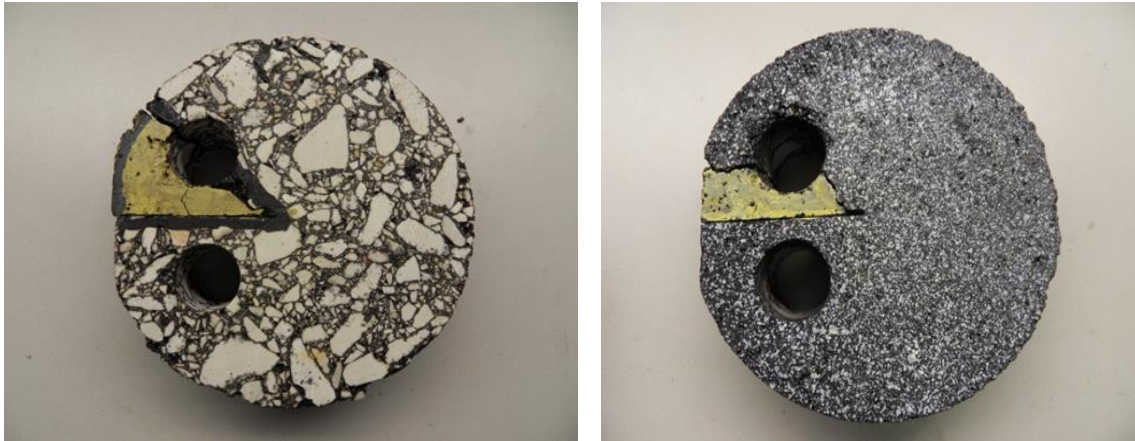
Breakage of standard DC(T) specimens at loading hole when subjected to repeated loading for certain mixes tested.
